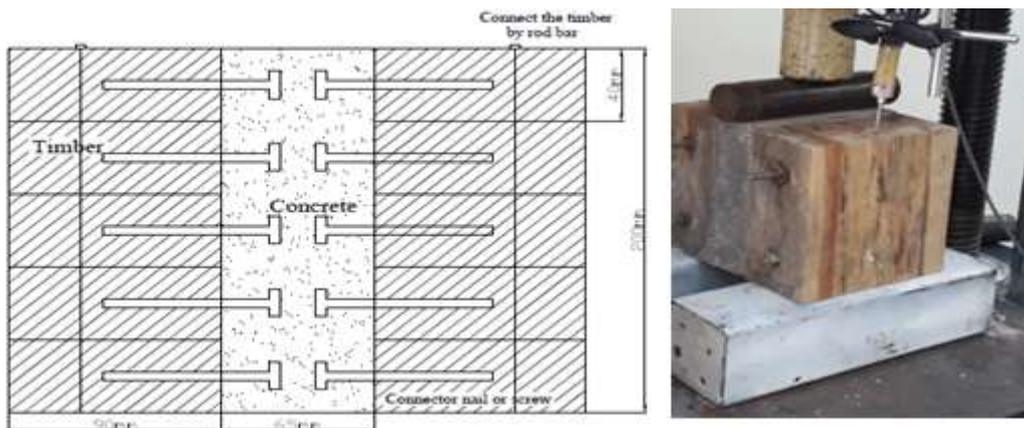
Push out test specimen plane view for 5 timbers (T5)
